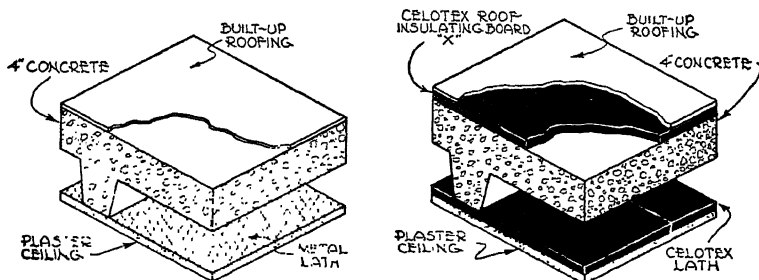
Typical Roof Insulation on Concrete Slab Construction
